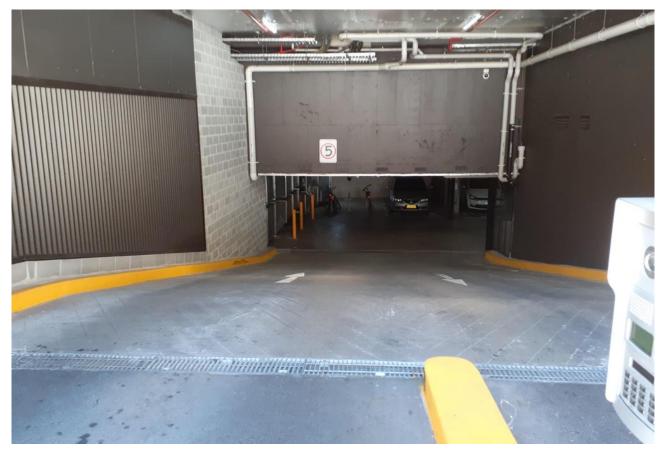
Two-way entry/exit for parking facility along Angelo Street (211 Pacific Highway)
